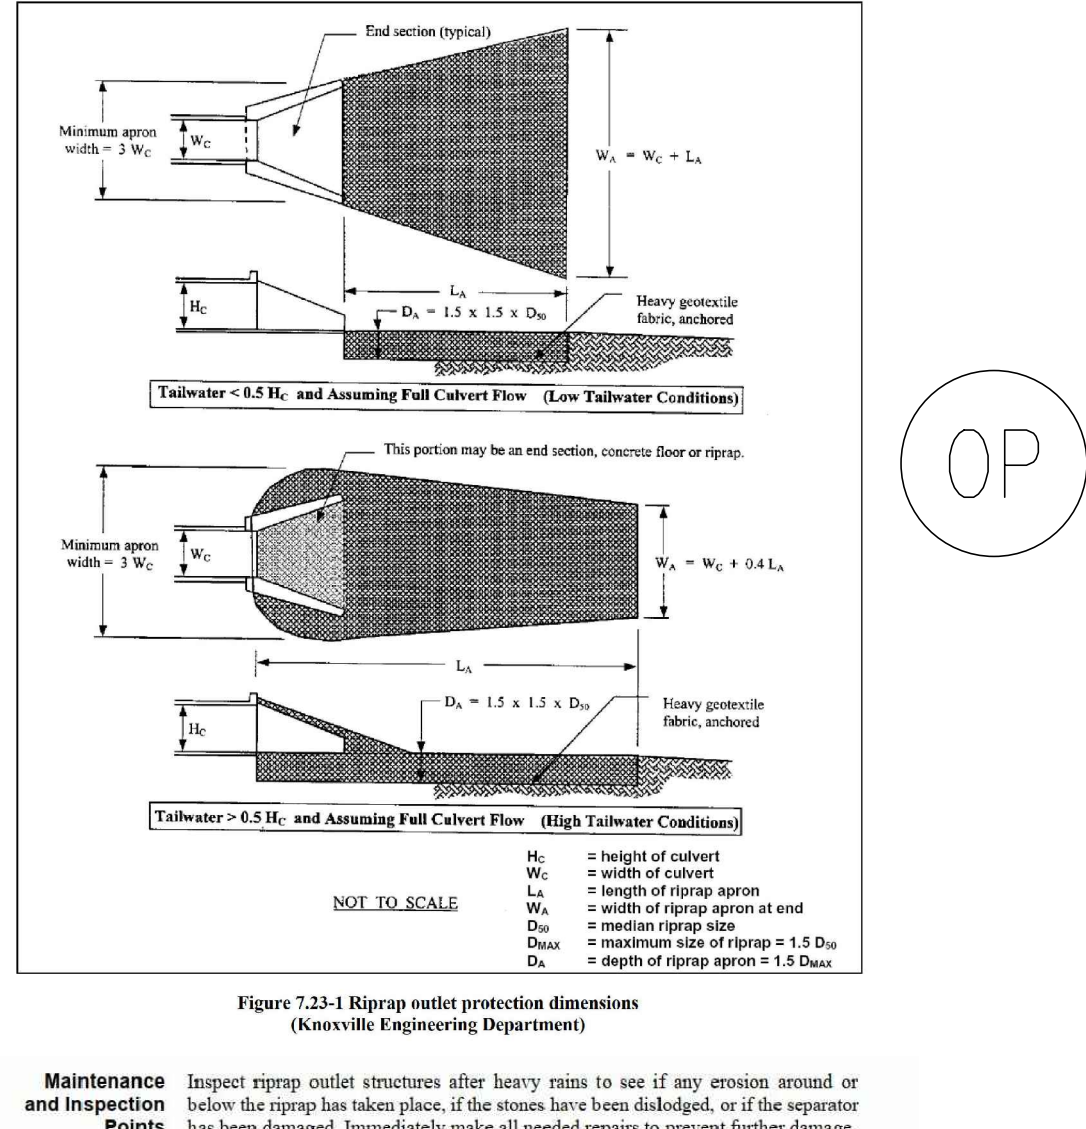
Riprap outlet protection dimensions (Knoxville Engineering Department)
